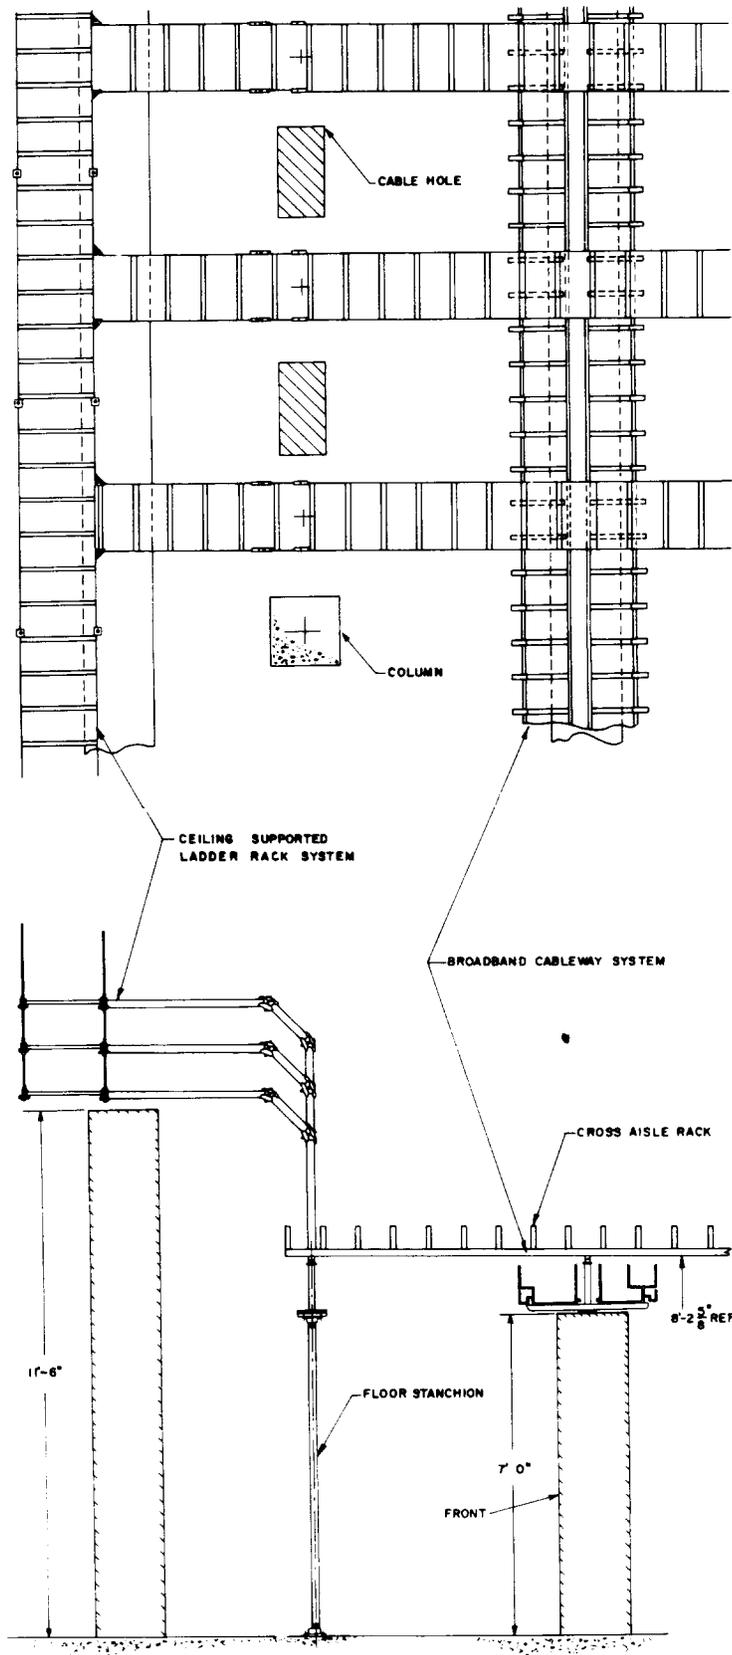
Interface of NEBS Broadband Cableway System with Non-NEBS Ladder Rack System
